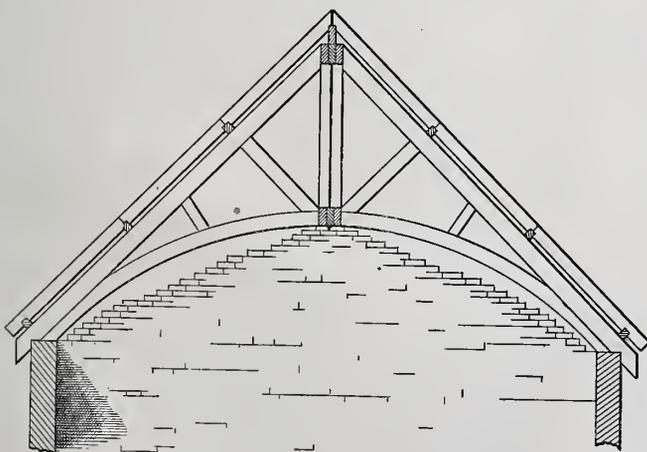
Sketch of Rafters Forming Church Roof, in Connection with a Howe Truss.
